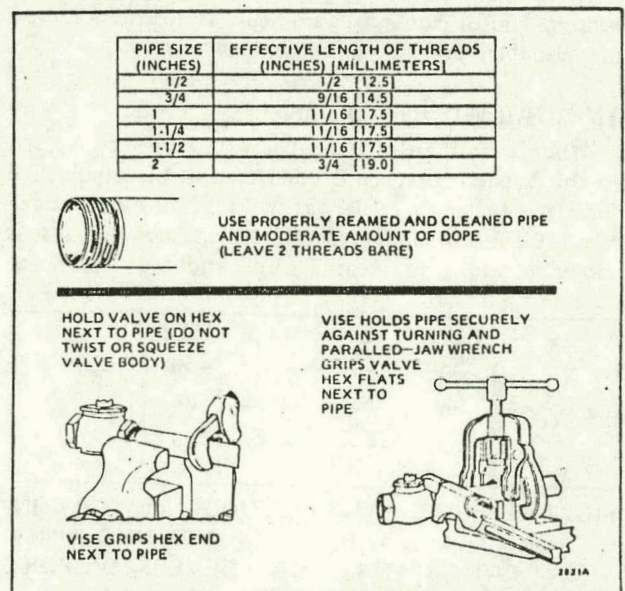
MOUNTING OF SCREWED VALVE BODIES.
